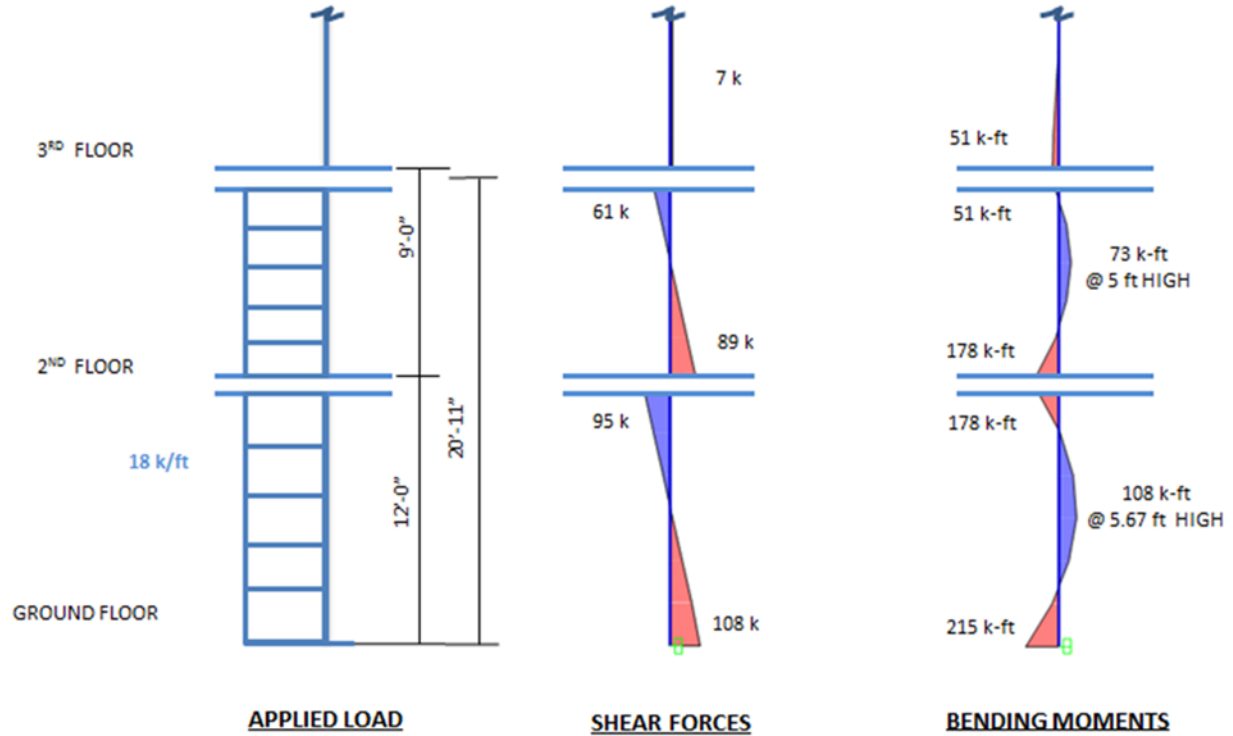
Hydrodynamic loading on exterior wall of Seaside residential building due to Load Case 2
